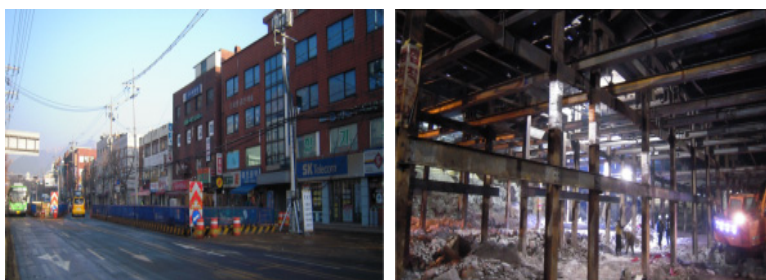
Condition of excavation works for the Urban utility tunnel(SMG, 2014)
